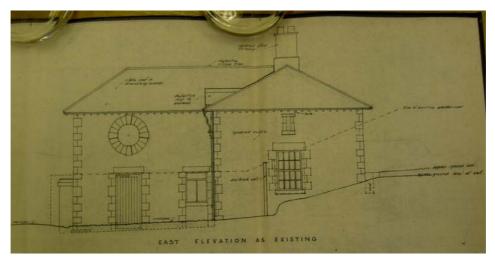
Coach House east elevation as existing in 1966 (BDB 33/12/9 1966-9)
